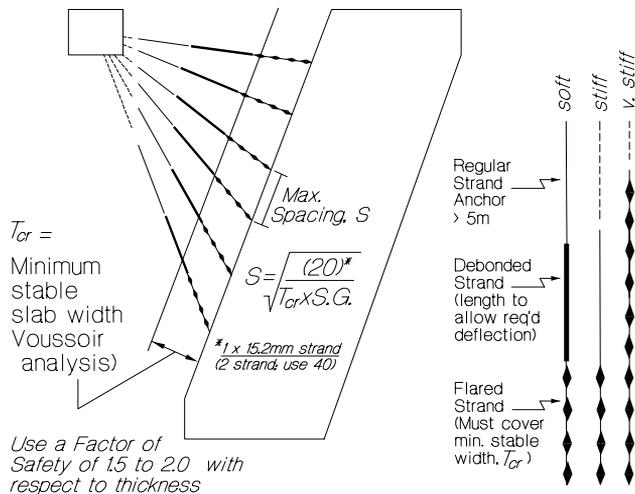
Cable spacing and length guidelines using Voussoir approach
